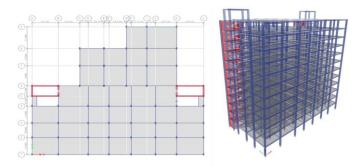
Plan view and 3-D view of the building model in ETabs 2018
